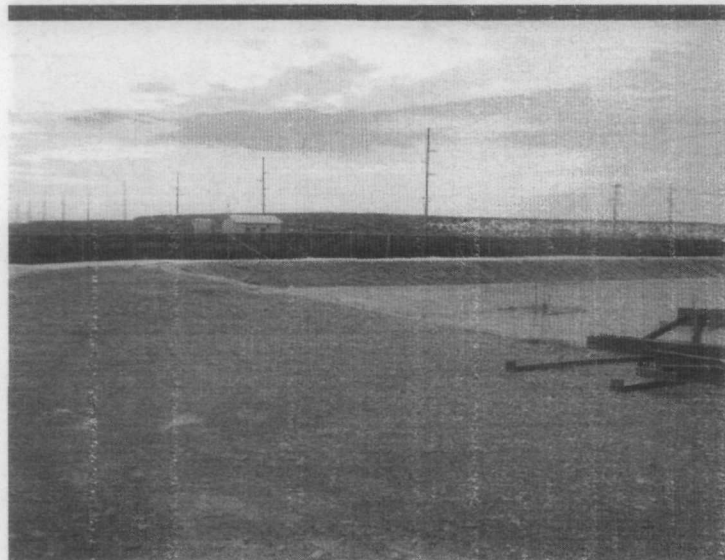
450,000 gallon collection pond. City Well #17 in background.
